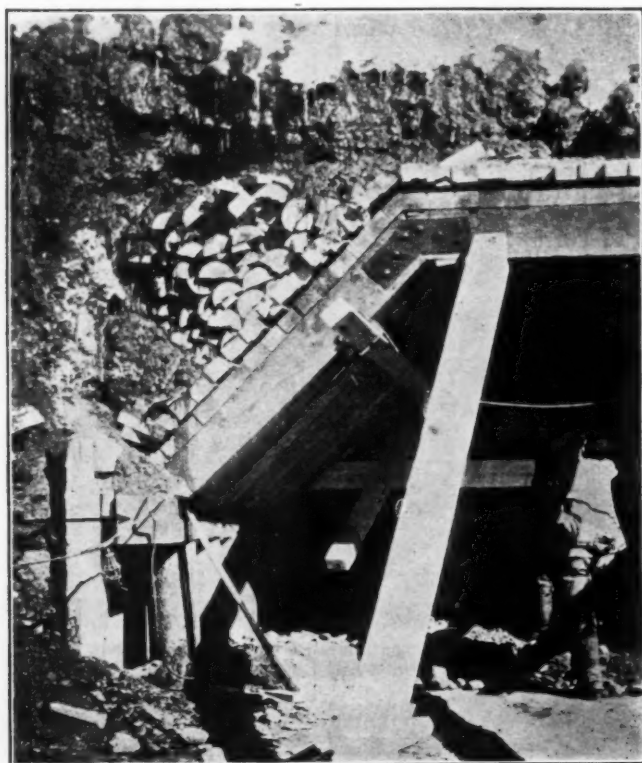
TOP HEADING SYSTEM WIDENED OUT, ARCHES BEING SUPPORTED ON WALL PLATES
